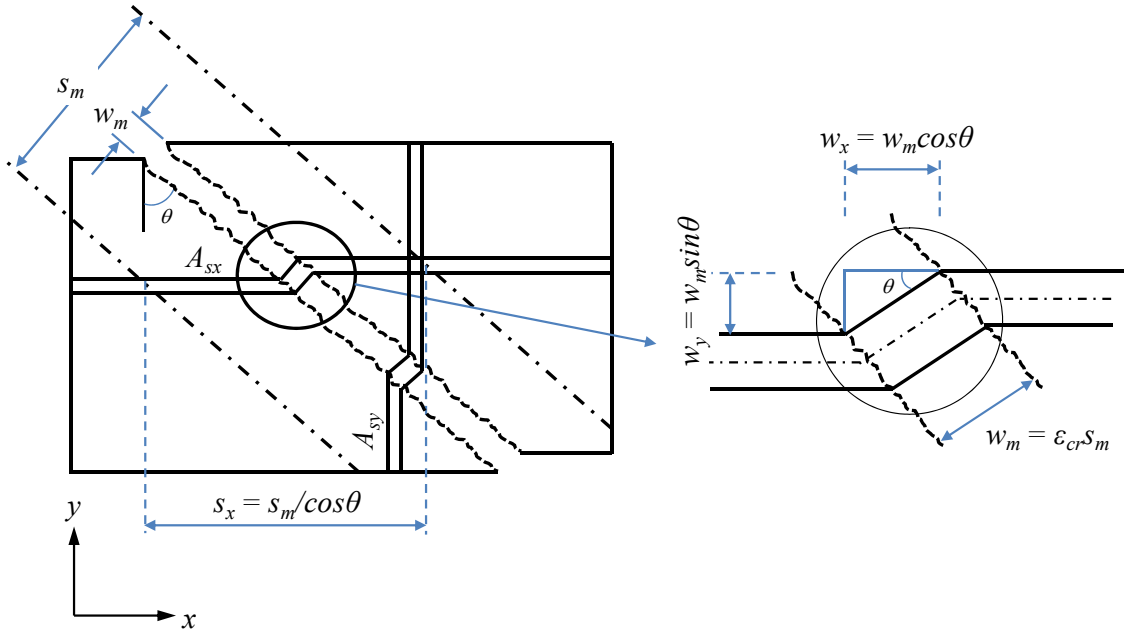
Cracked Reinforced Concrete Member (Zararis, 1988)
